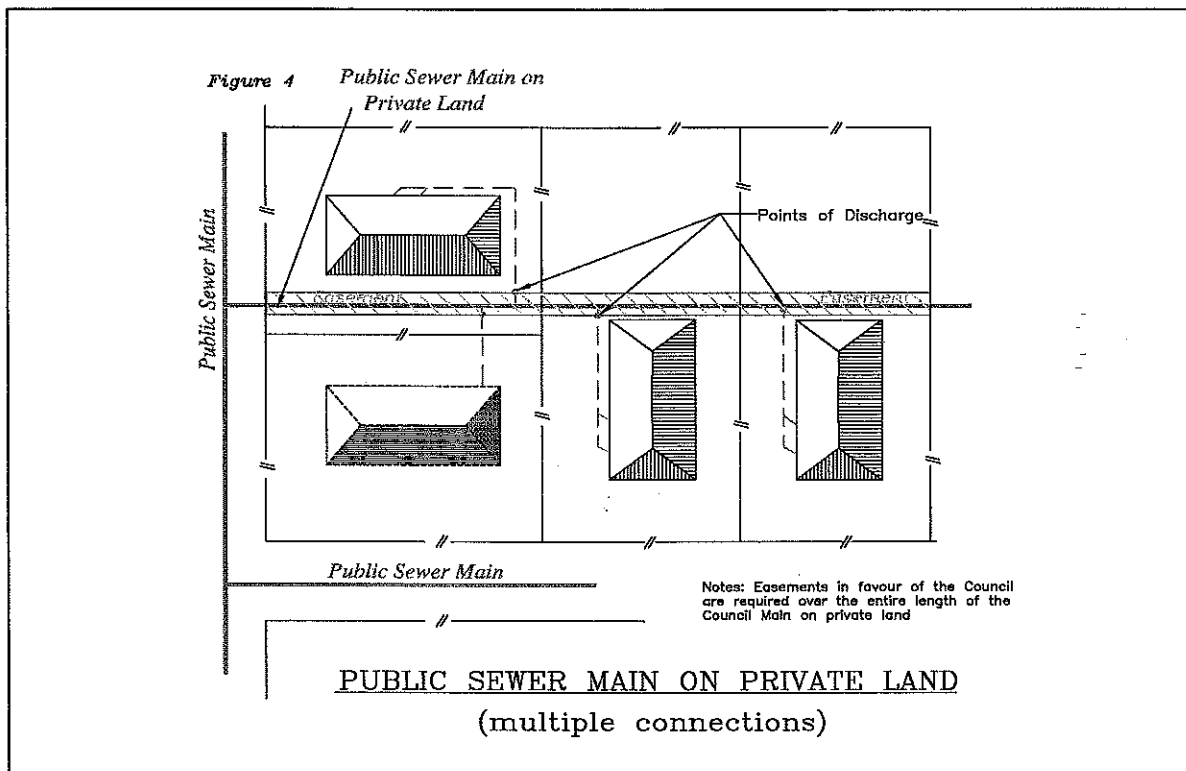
Typical layout at point of discharge – Public sewer main on private land – Easement required.
